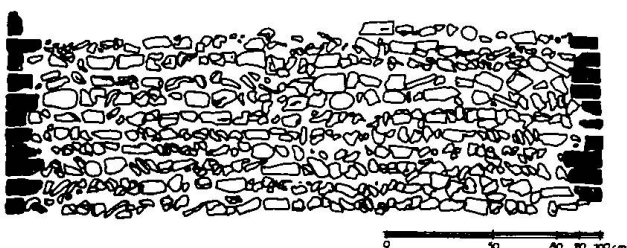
Cross section of the wall of the Civic Tower of Pavia
